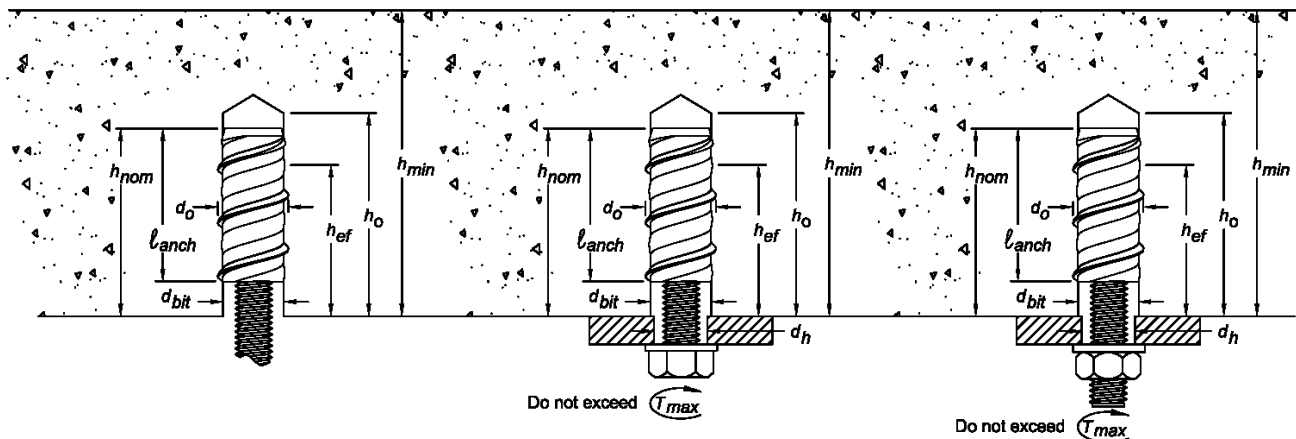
SNAKE+ SCREW ANCHOR INSTALLED WITH STEEL INSERT ELEMENT
